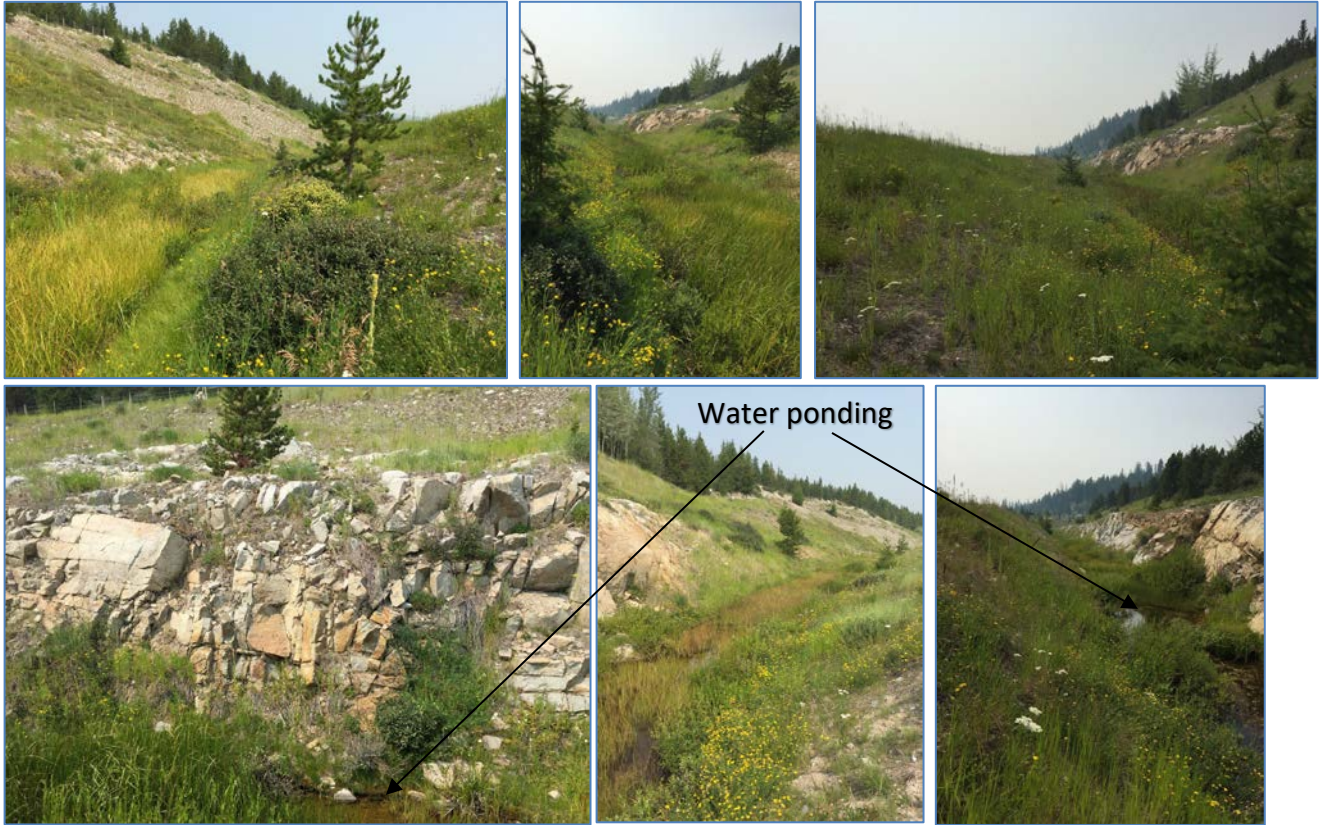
Spillway channel – transition to riprap lined section (TRJ-2018-16)
